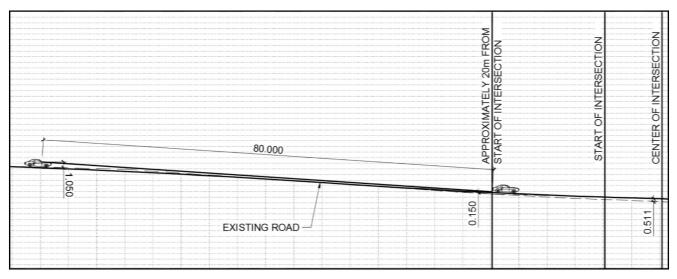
Stopping sight distance of Mc Gregor Street and the proposed intersection with raised vertical alignment.
